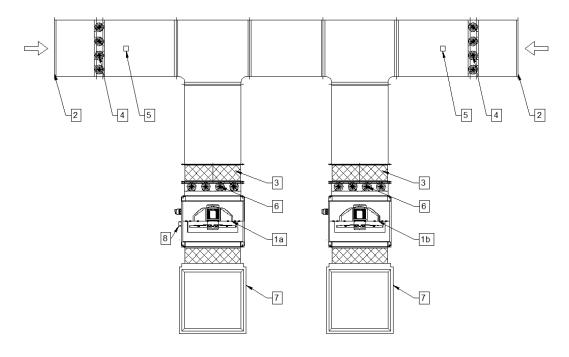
Sample installation of an mcr EXi-F air supply unit on the roof with a back-up unit: 1a - air supply unit basic fan, 1b - air supply unit back-up fan, 2 - intake vent, 3 - flexible connection, 4 - dampers with actuators in a double intake vent system, 5 - duct smoke detector, 6 - shut-off damper, 7 - ventilation duct, 8 - pressure switch.
